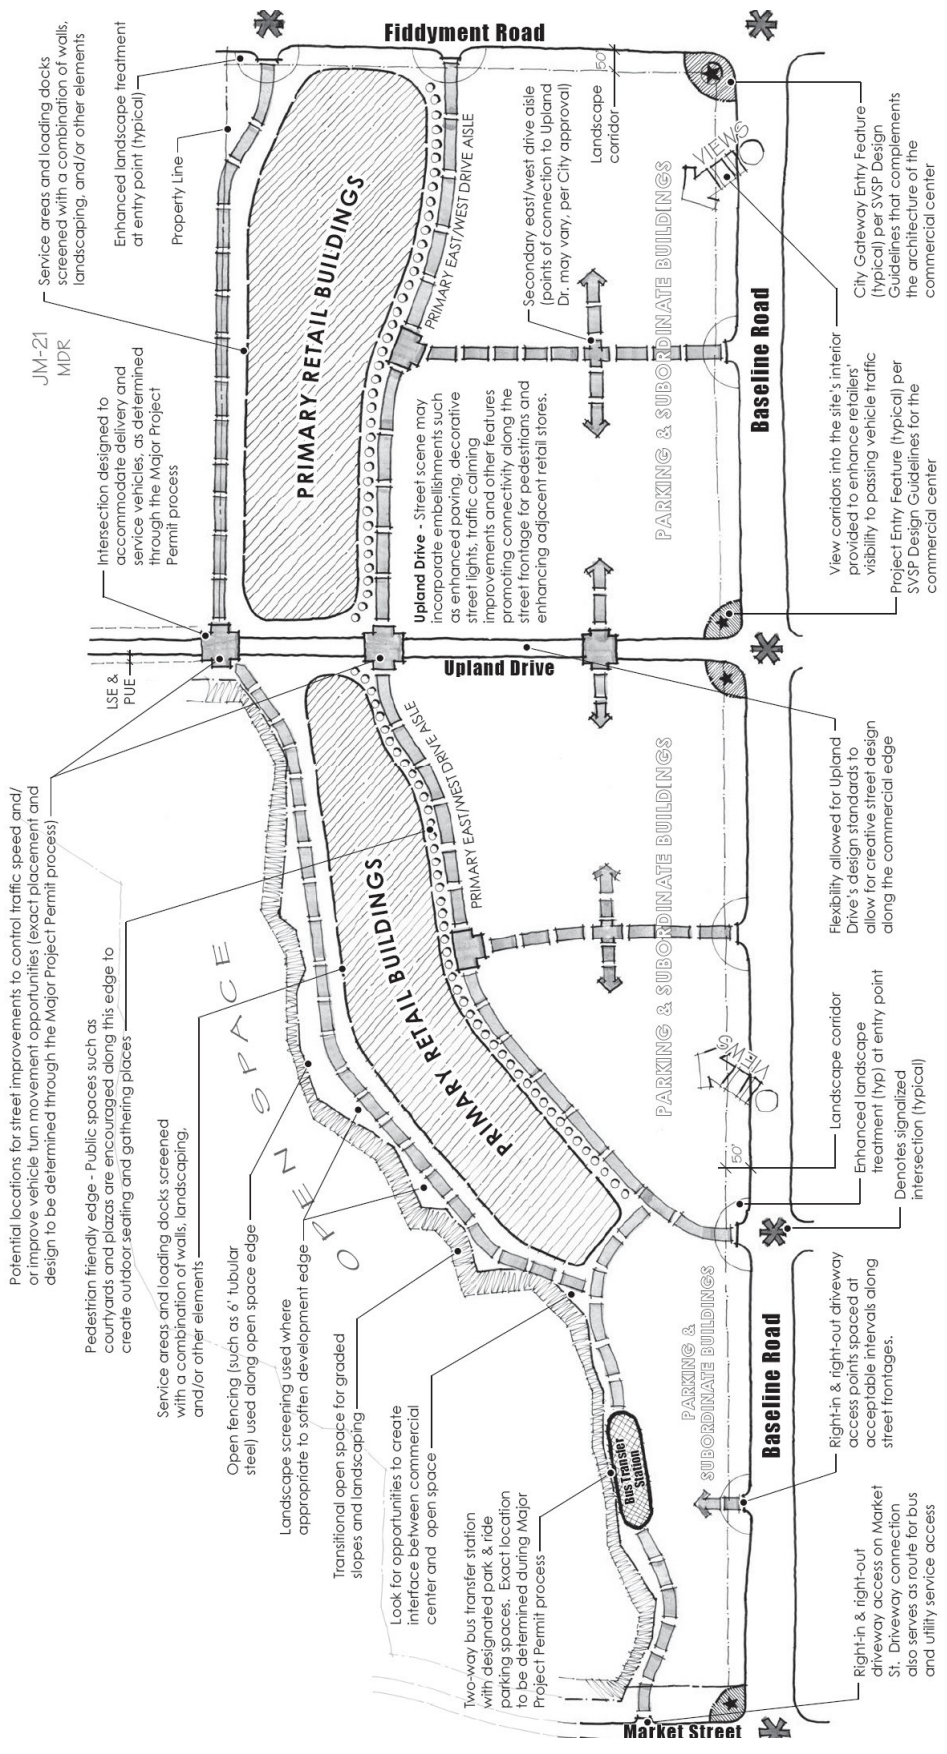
Concept Plan for Parcels DF-40, 41, & 42
